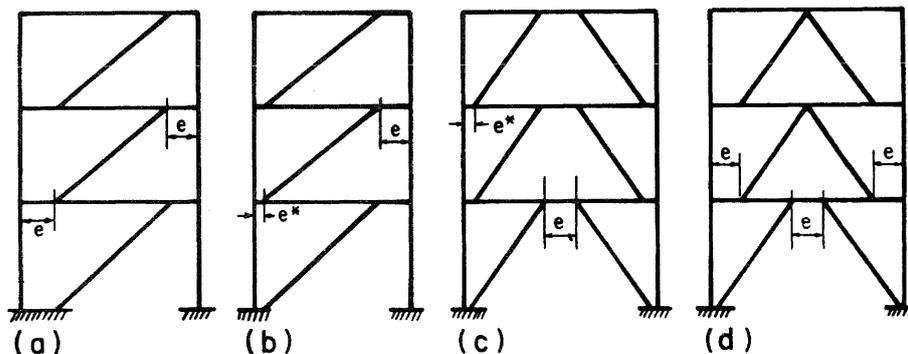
SOME ALTERNATIVE BRACING ARRANGEMENTS FOR EBFs
